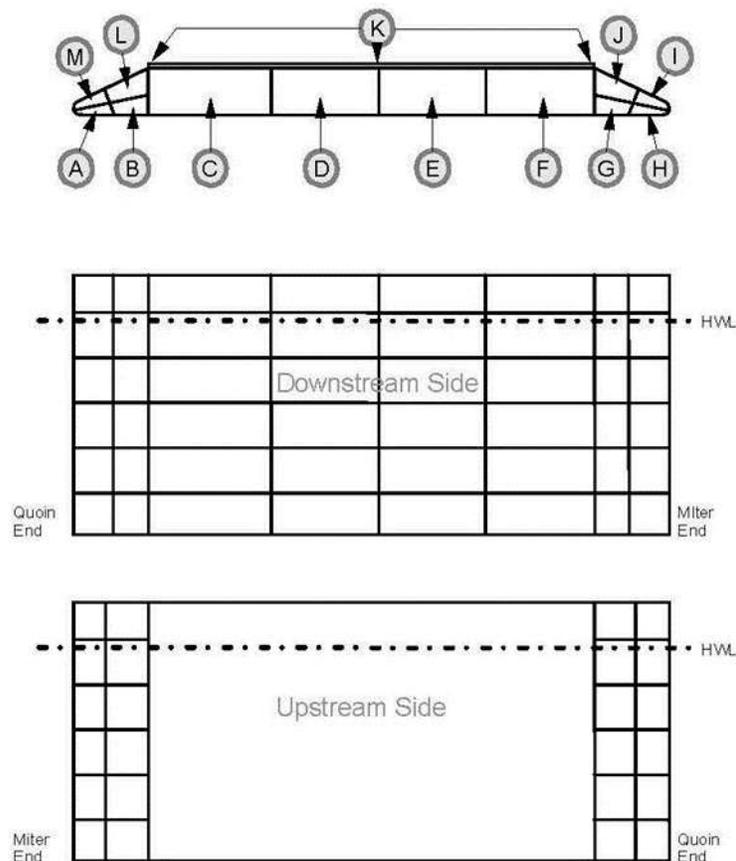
Lock Gate Vertical, Downstream, and Upstream Structural Layout
